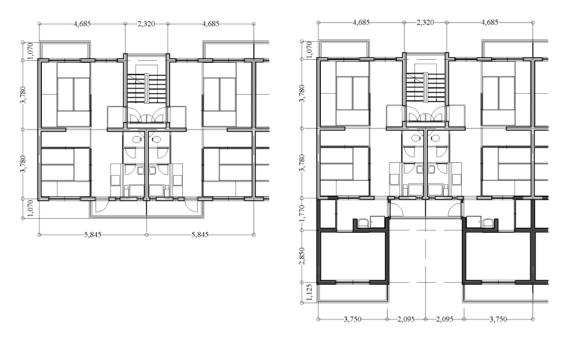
One Pair of Dwelling Units Plans Before and After Extension
